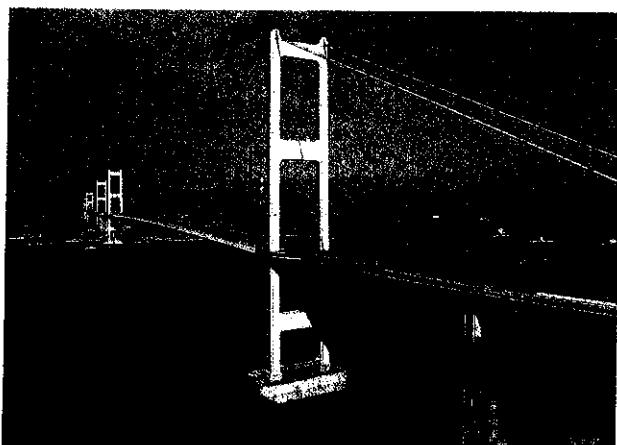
View of 3rd Kurushima Kaikyo Bridge
